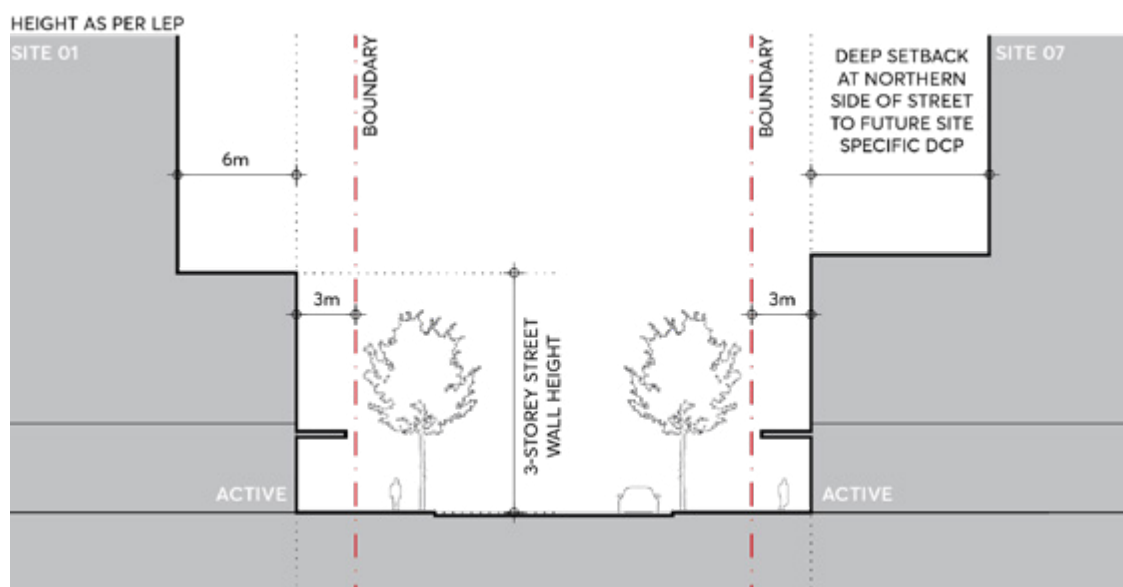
Marion Street (Section B) Setbacks and Street Wall Height
